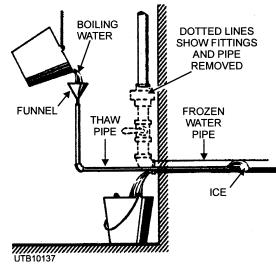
Thaving an underground or otherwise inaccessible pipe.
